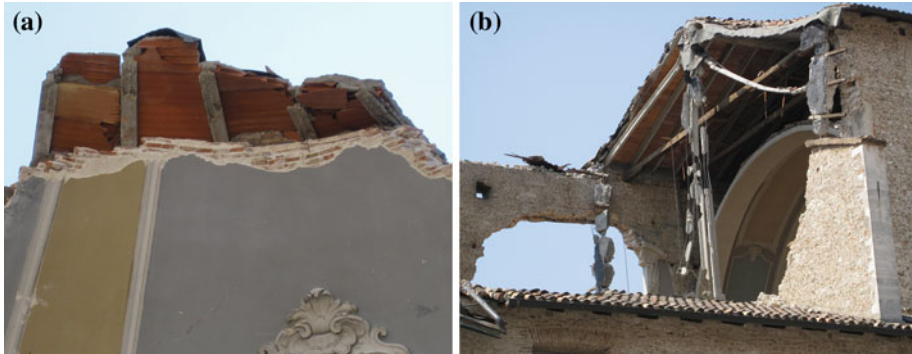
The modern roof made by r.c. precast elements and unreinforced concrete slab in Santa Maria Paganica church in L'Aquila: a the small portion of the dome which did not collapse; b trusses with pre-cast r.c. joists
